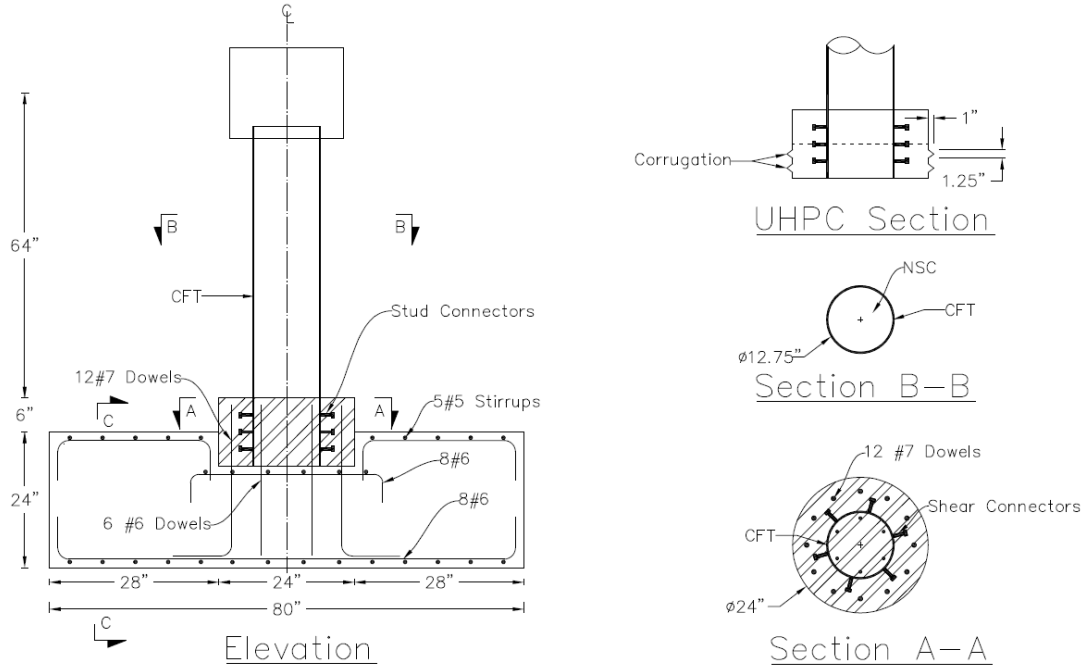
Schematic detail of specimen-1 showing dimensions and reinforcement details.
